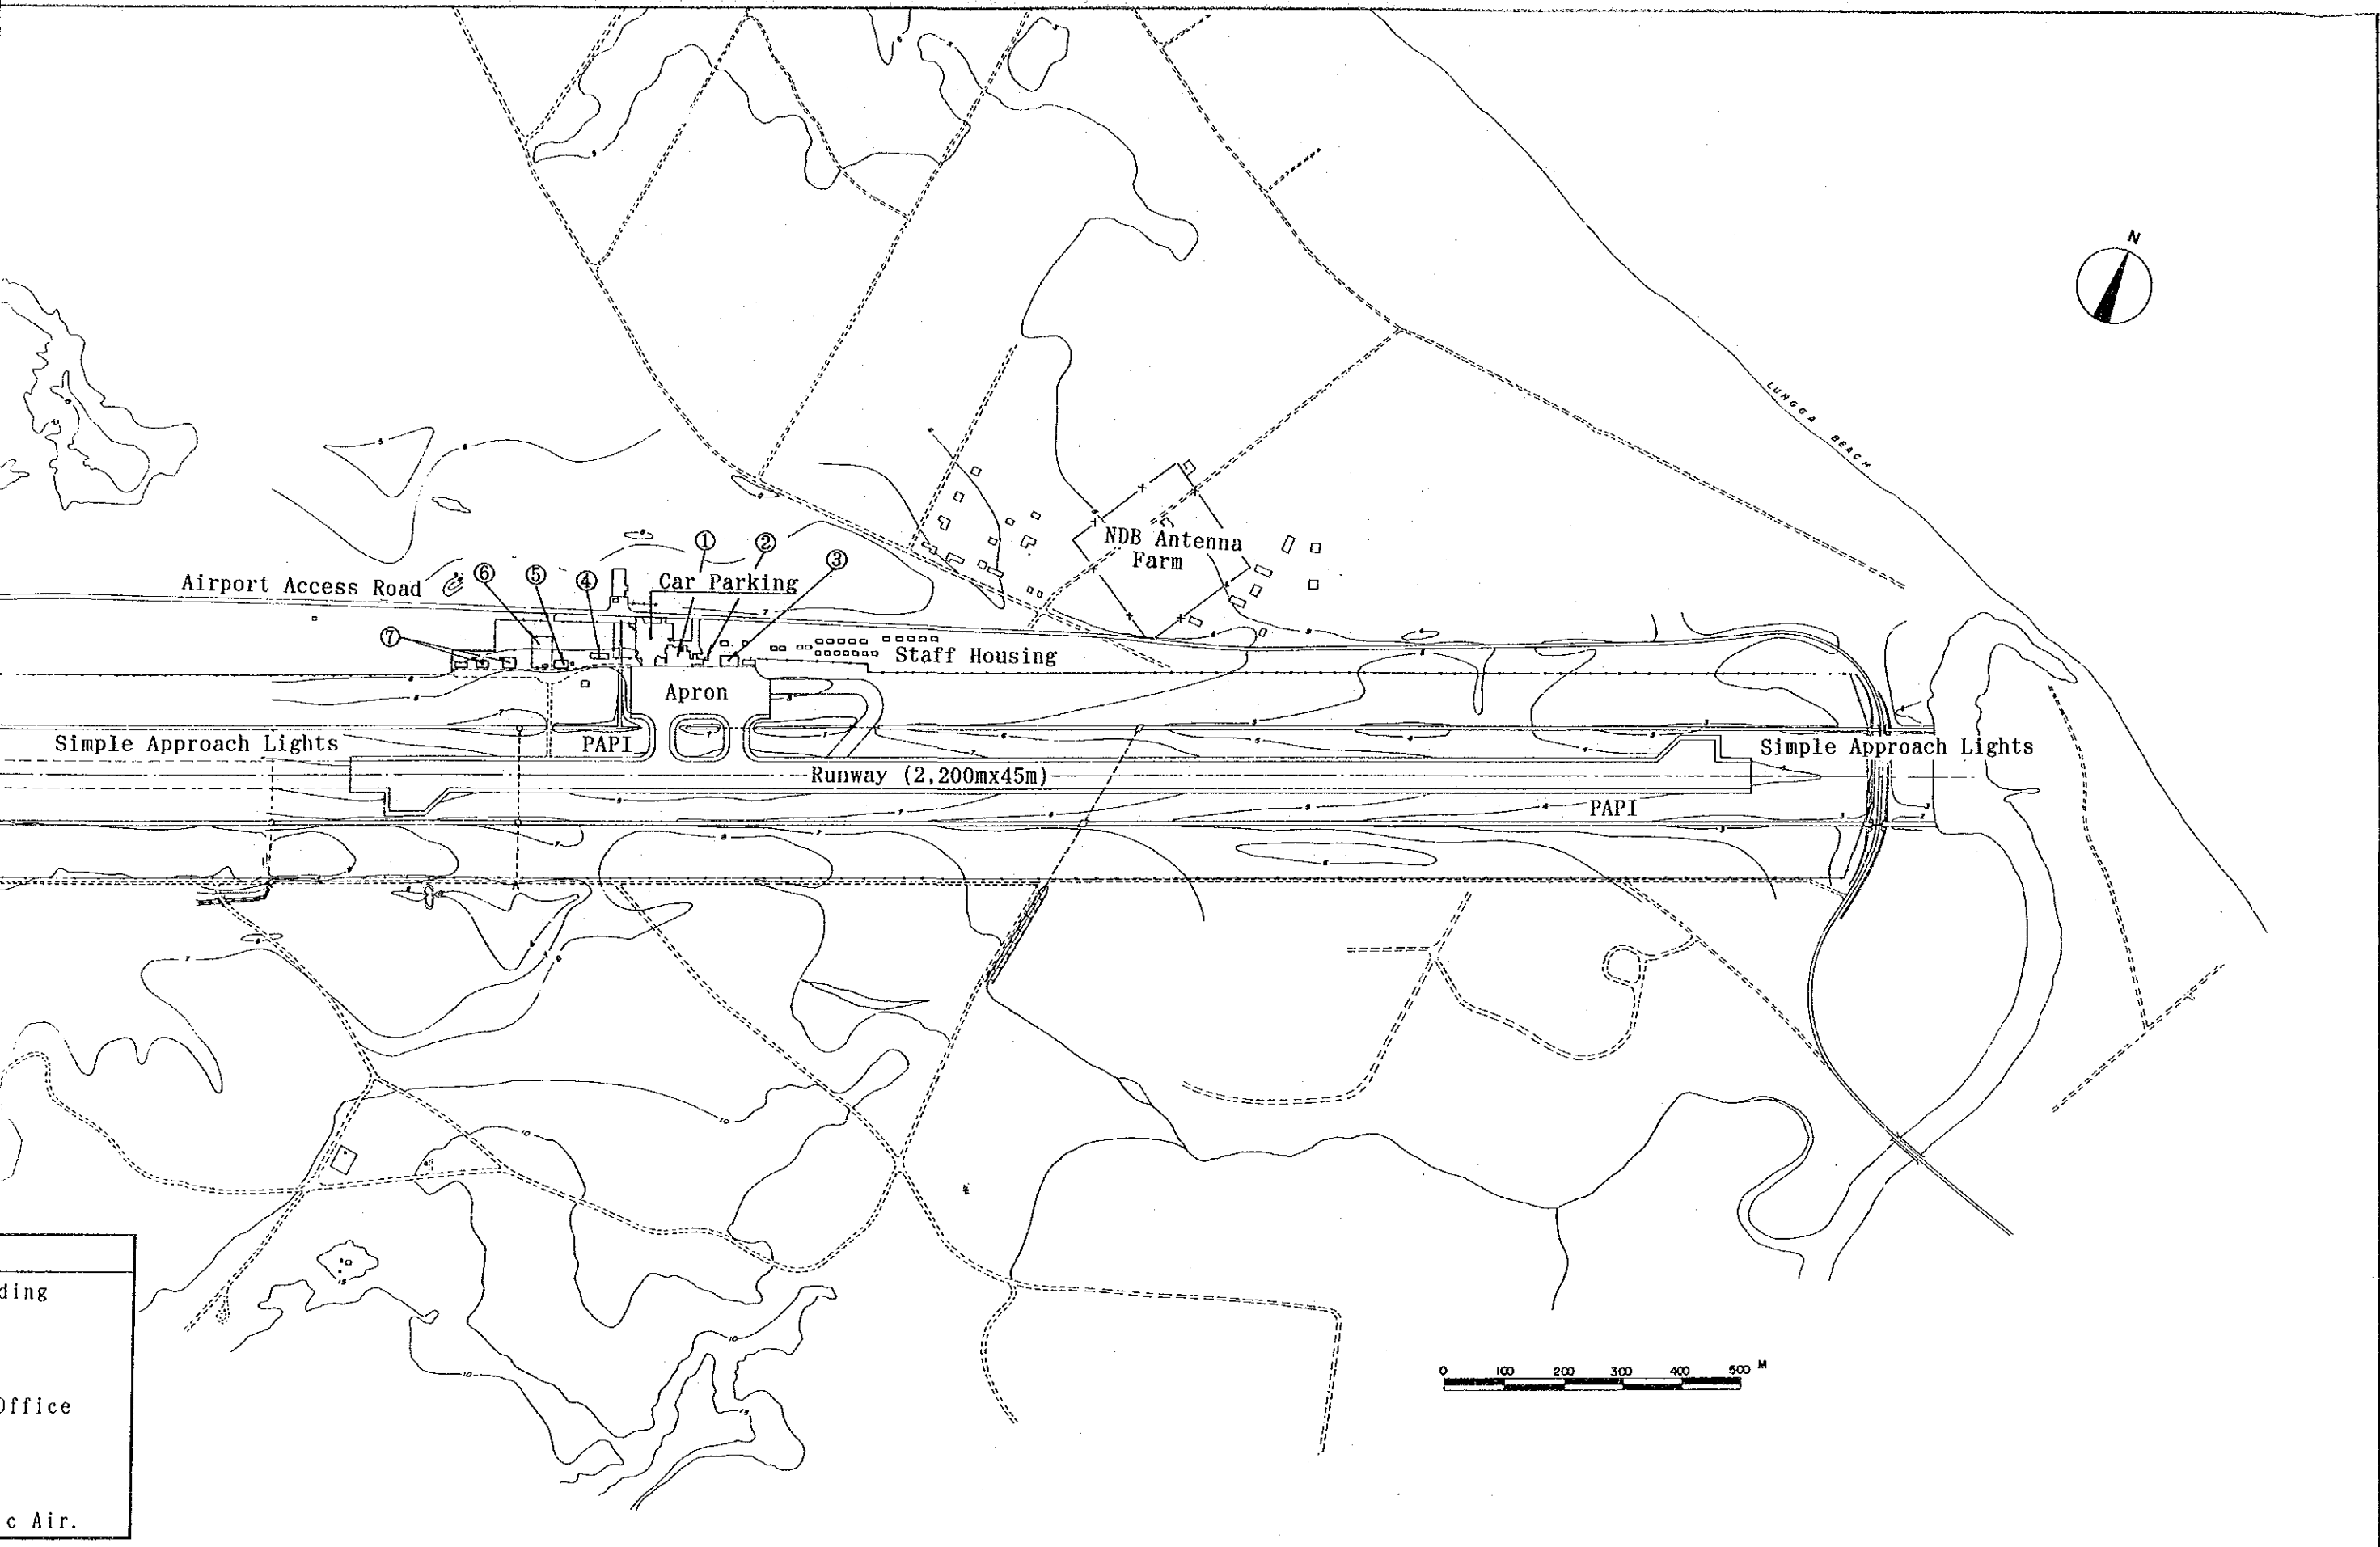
Layout Plan of Existing Henderson International Airport
